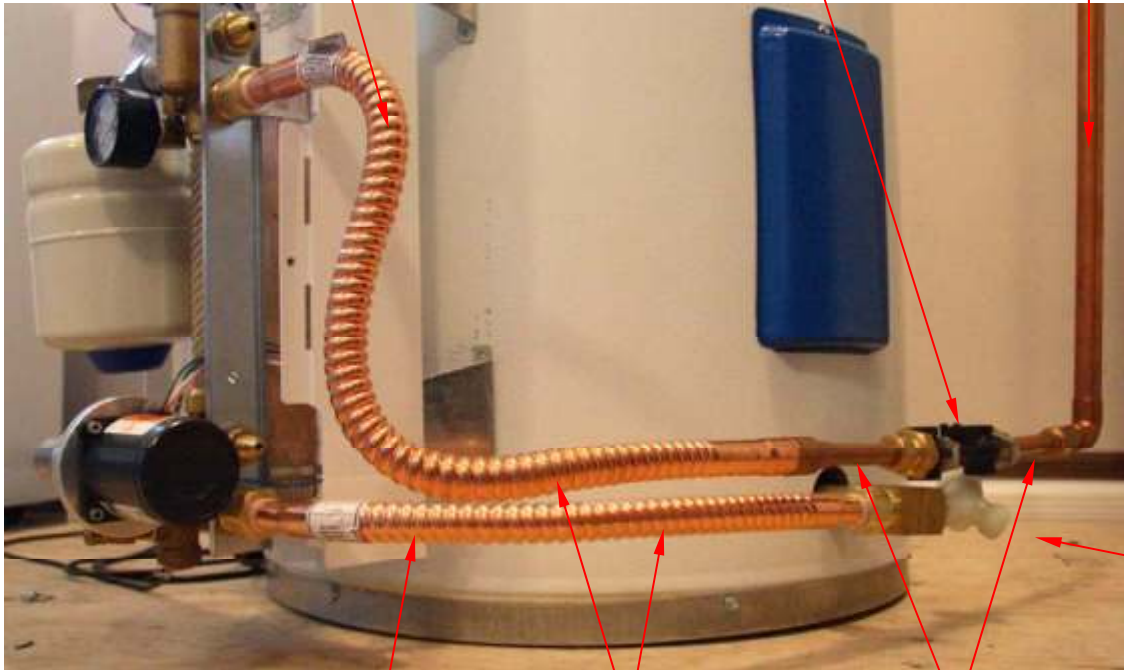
Thread and tighten 24" (60.96 cm) flexible corrugated pipe to cold mains inlet. Using two hands, bend pipe down and back.
